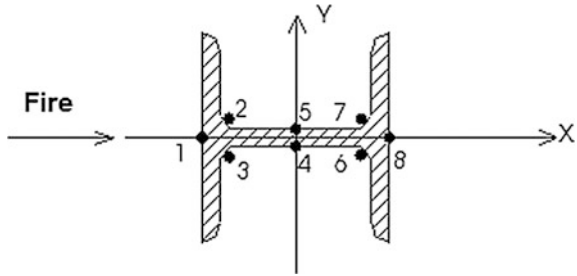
02 steel column protected by gypsum plasterboard 12.7 and 15.8 mm
